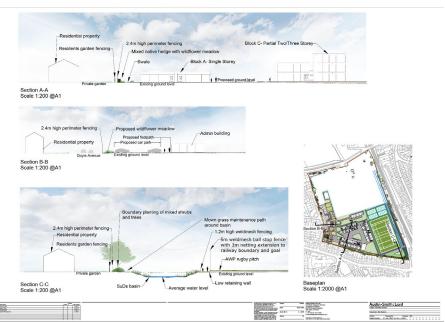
Section Plan through site showing the location of the temporary school in relation to adjoining boundaries
